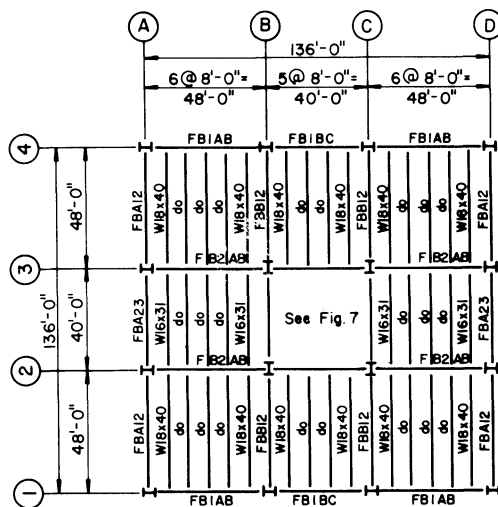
Rigid frame 20-story building—floor framing (floors 2-20)
